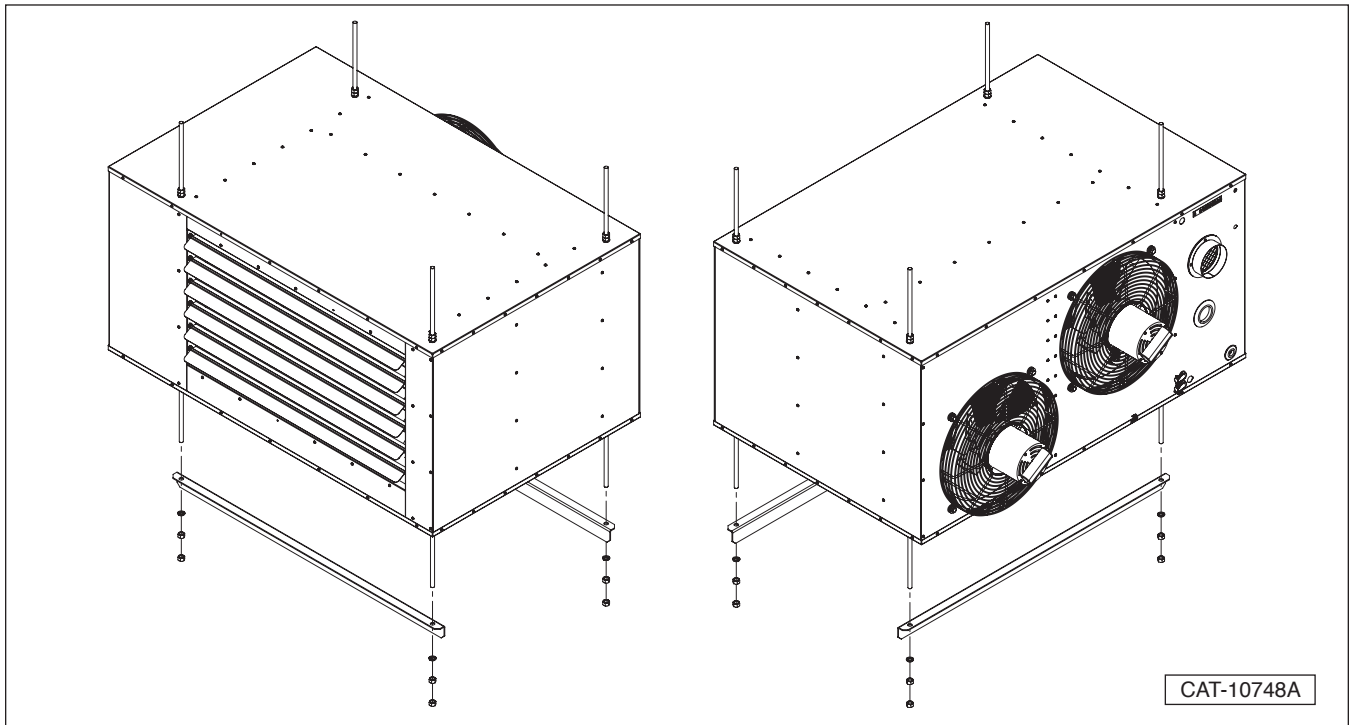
C - Heater Mounting: Steel Construction (for all sizes)
